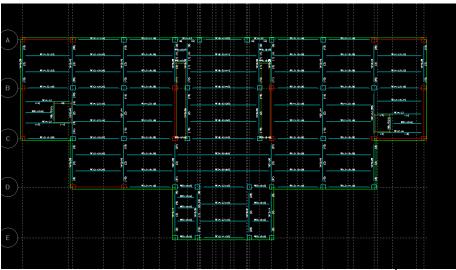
Beam / Girder Strength Check in RAM ( 2<sup>nd</sup> floor )
